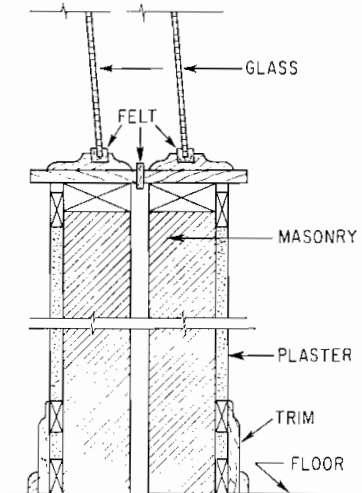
Sound-insulating window construction showing structural separation of double wall. Glass windows in studios and control rooms should be offset about 10°, and they should be mounted as shown on a double wall.
